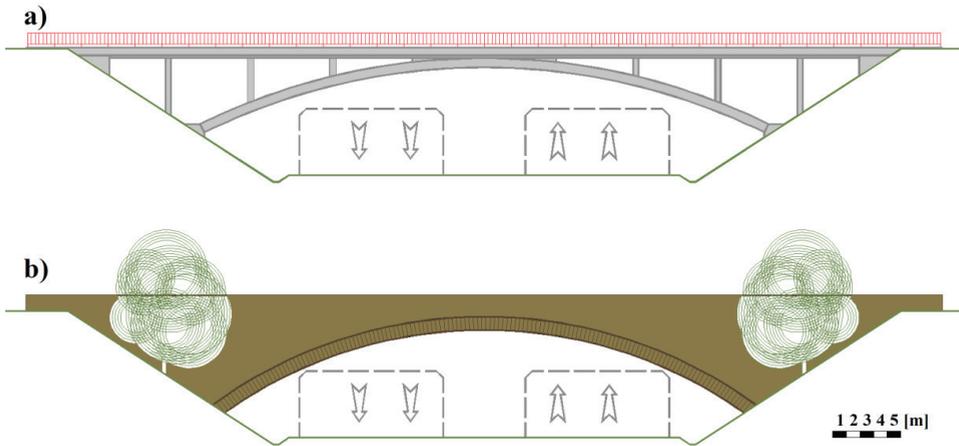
One span arch viaducts a) openwork, b) solid
